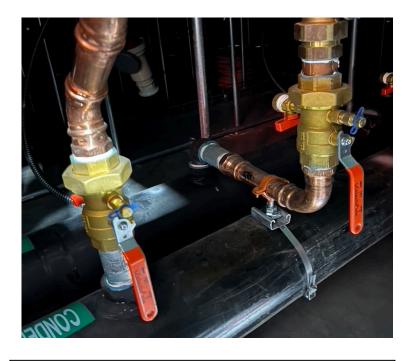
Both inlet and outlet shut off valves are open, with testing equipment removed and caps reinstalled
